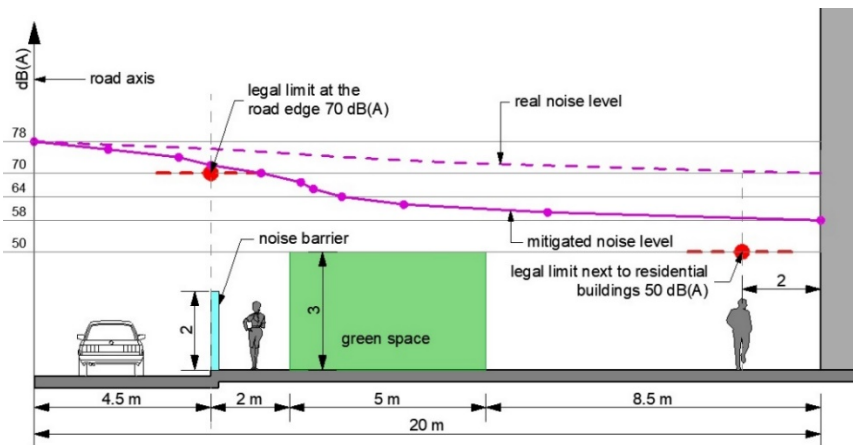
Highlighting the noise level - cross-sectional profile of 2 lanes street with barrier and green space ($h = 3.00\text{m}$).
